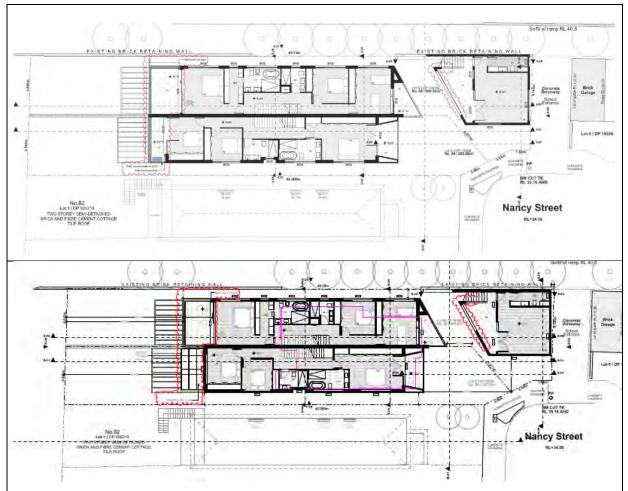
Comparison First Floor Level plan showing original plan (top) and review plan (bottom)
